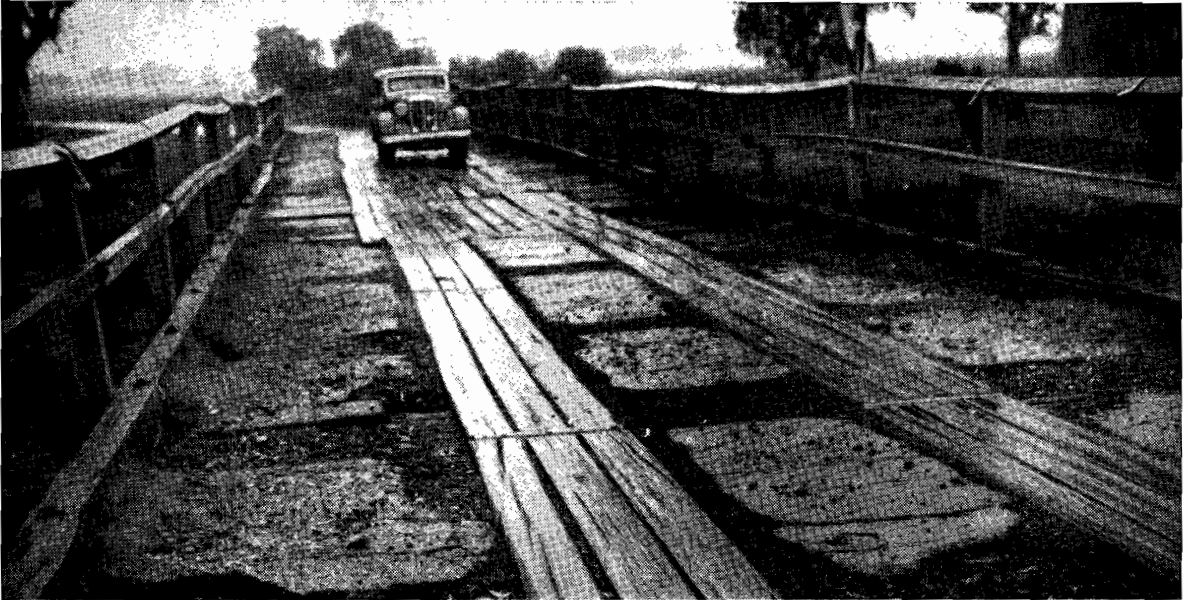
Decrepit bridge over Corryong Creek on Corryong Road.
